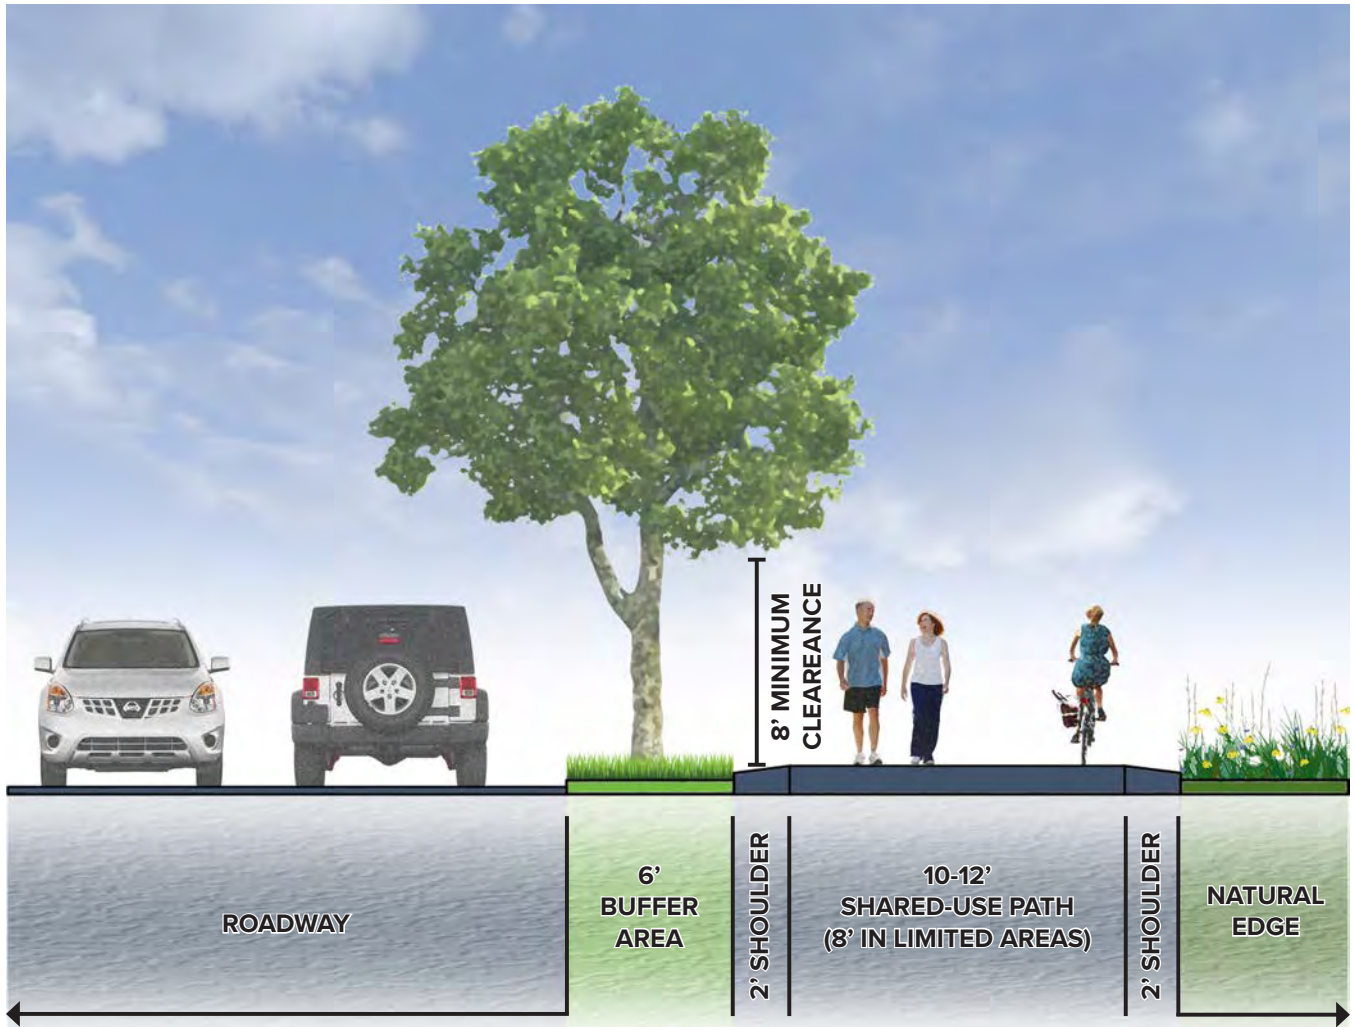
Typical cross section of the sidepath construction of the connection between Ferdinand and the Ferdinand State Forest.
